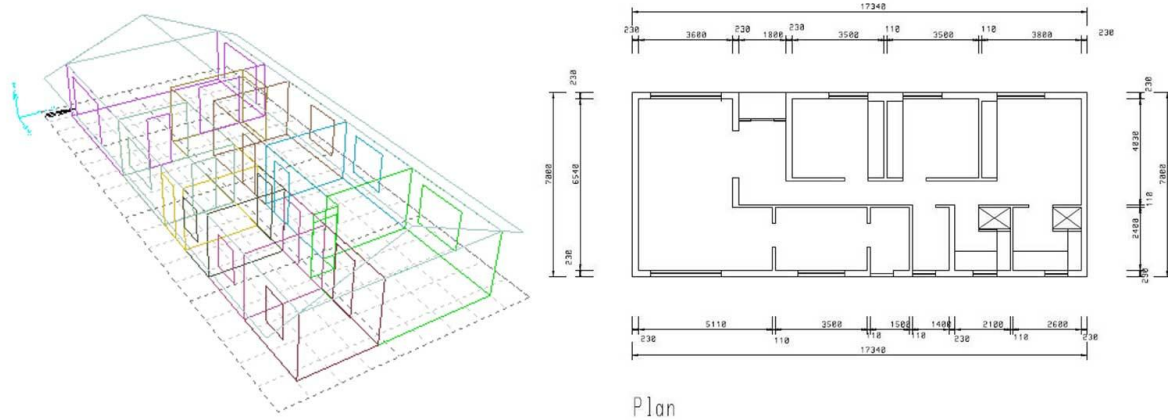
3D thermal model (left) and building plan (right) used in thermal analyses (authors)
